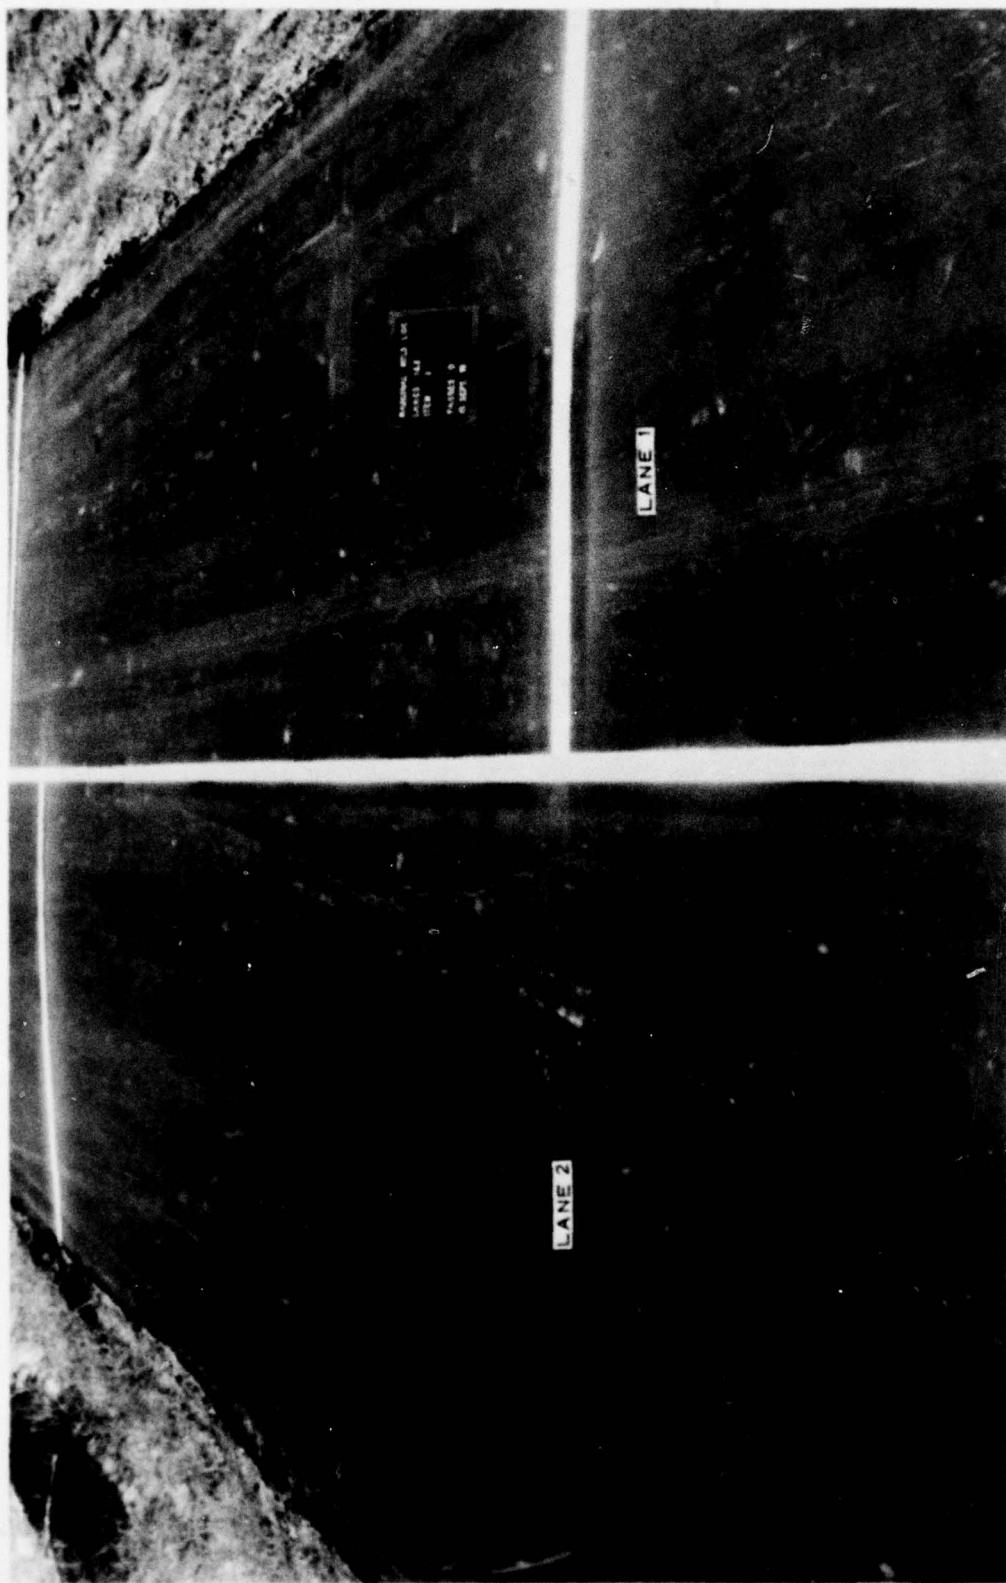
General view of item 3 (flexible pavement) prior to traffic
